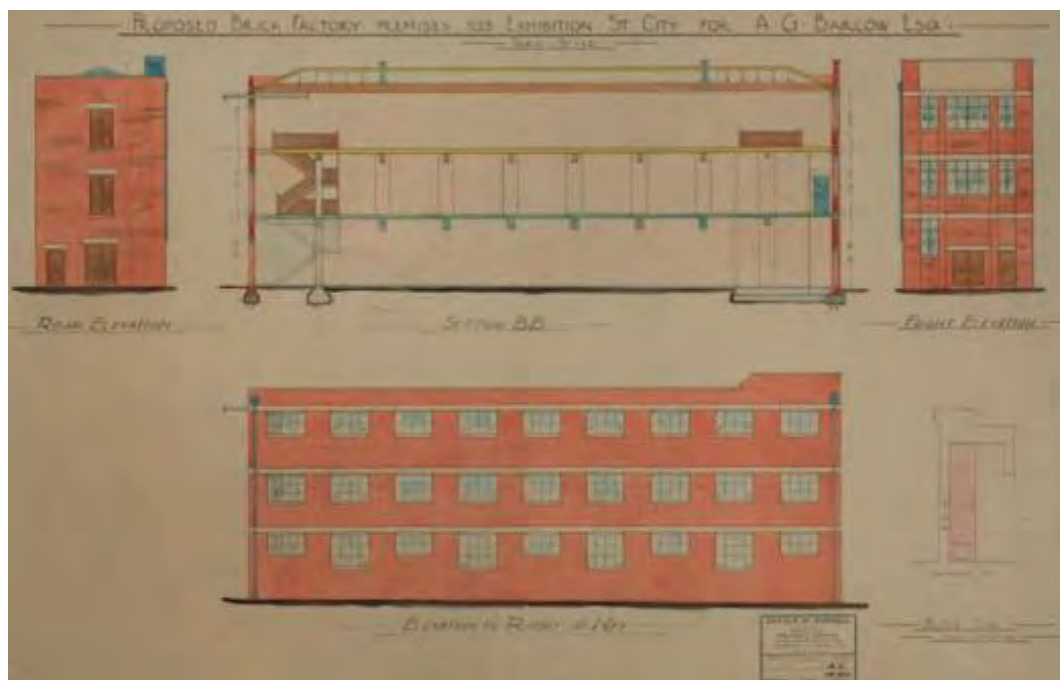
Architect Arthur W Purnell's design for Barlow Motors Pty Ltd's building at 353 Exhibition Street. (Source: Groves 2009:33)
